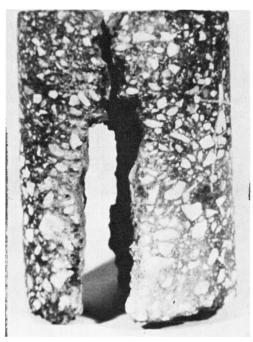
A side view of that same crack. It was very revealing that, at the lower elevations of the asphalt pavement, there was considerable stripping of the asphalt from the aggregate and, with the continued traffic and hydraulic action of water in these cavities and under the pavement, the fines were being pumped out of the pavement and causing rather severe depressions at the transverse thermal cracks.
